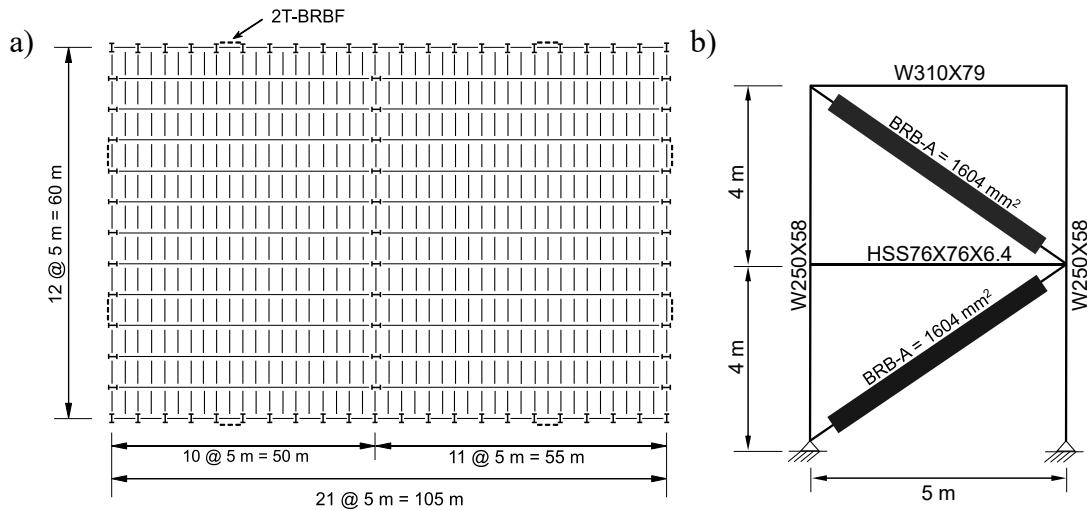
a) Roof plan of the selected building; b) Elevation of the selected frame.
